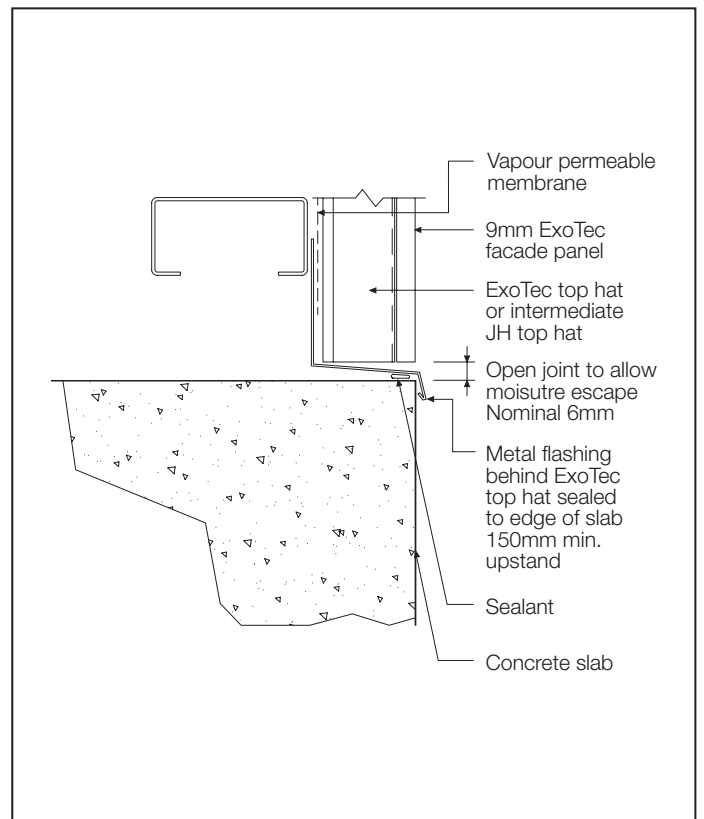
WALL BASE TYPICAL DETAIL 2
